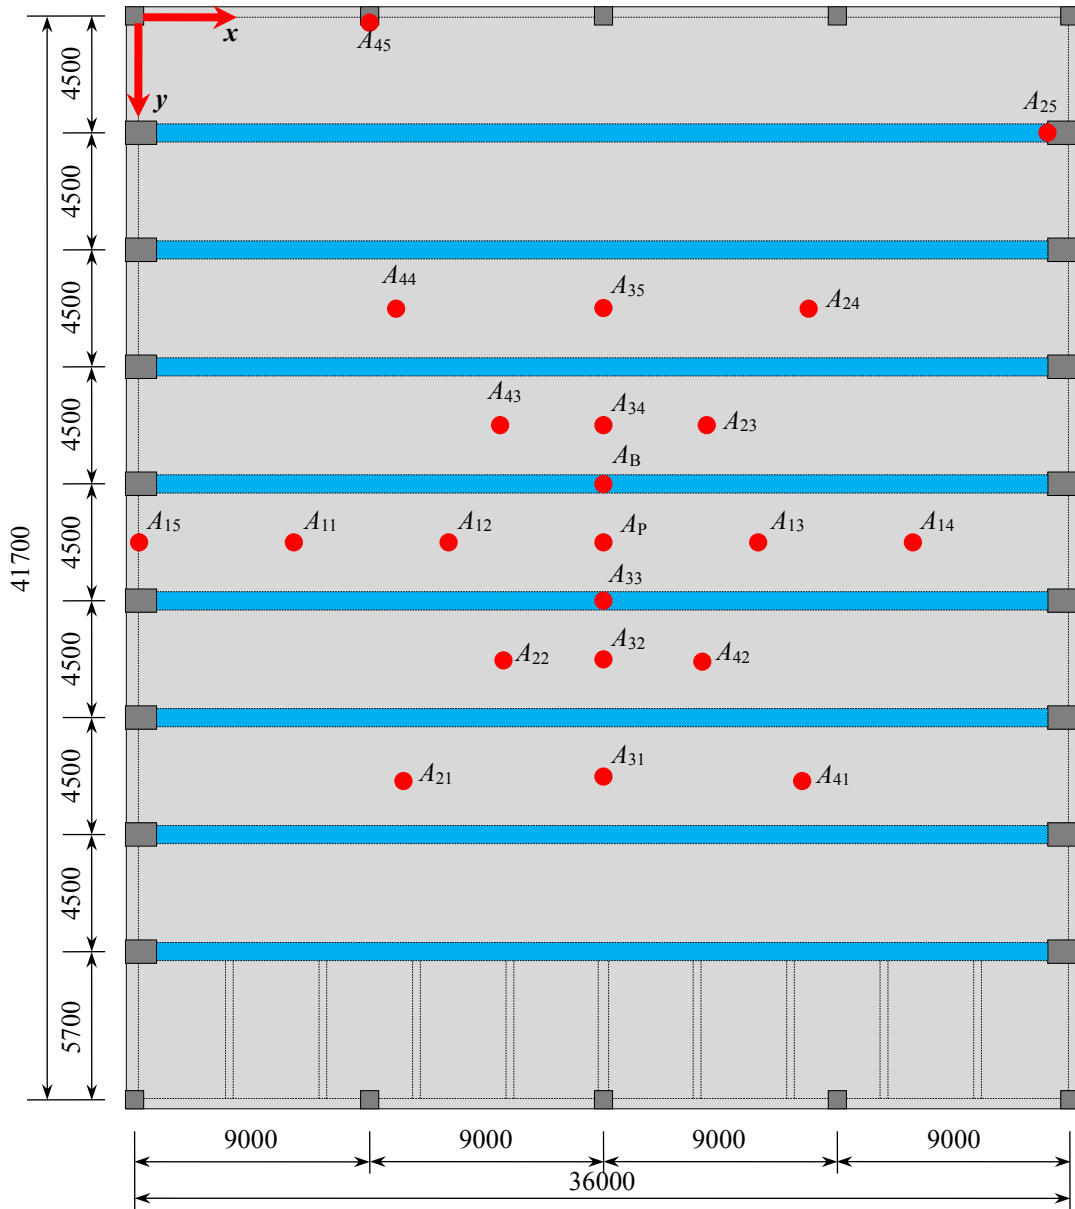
Outline of prestressed concrete floor #6 (all dimensions in mm)
